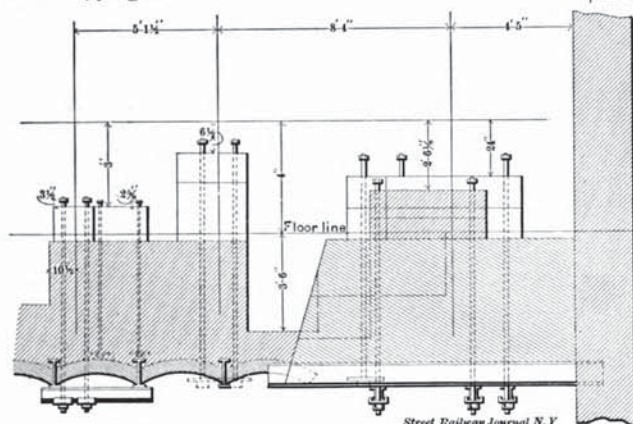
TRANSVERSE SECTION OF ENGINE FOUNDATION—COLUMBUS RAILWAY POWER STATION.
